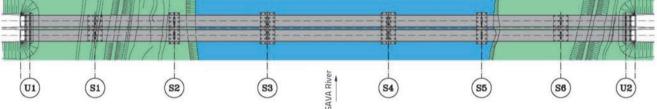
Longitudinal profile and plan view of Svilaj Bridge [4]
